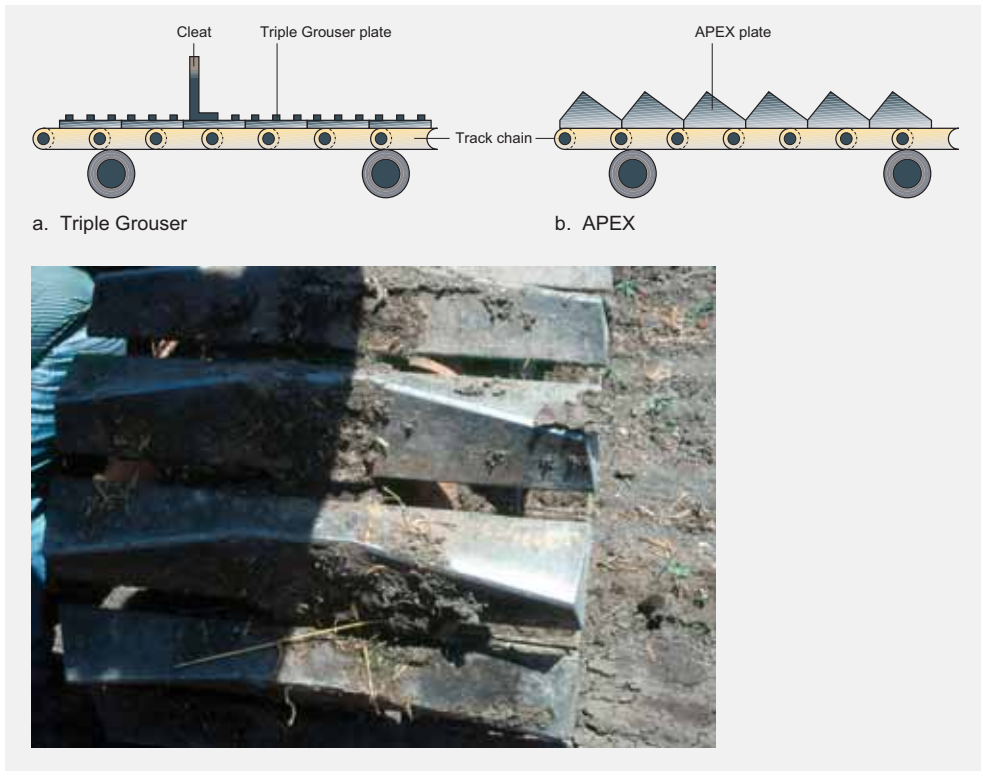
Tracks used for trenchless drainage machines: a) Triple Grouser plate and; b) "APEX" plates
